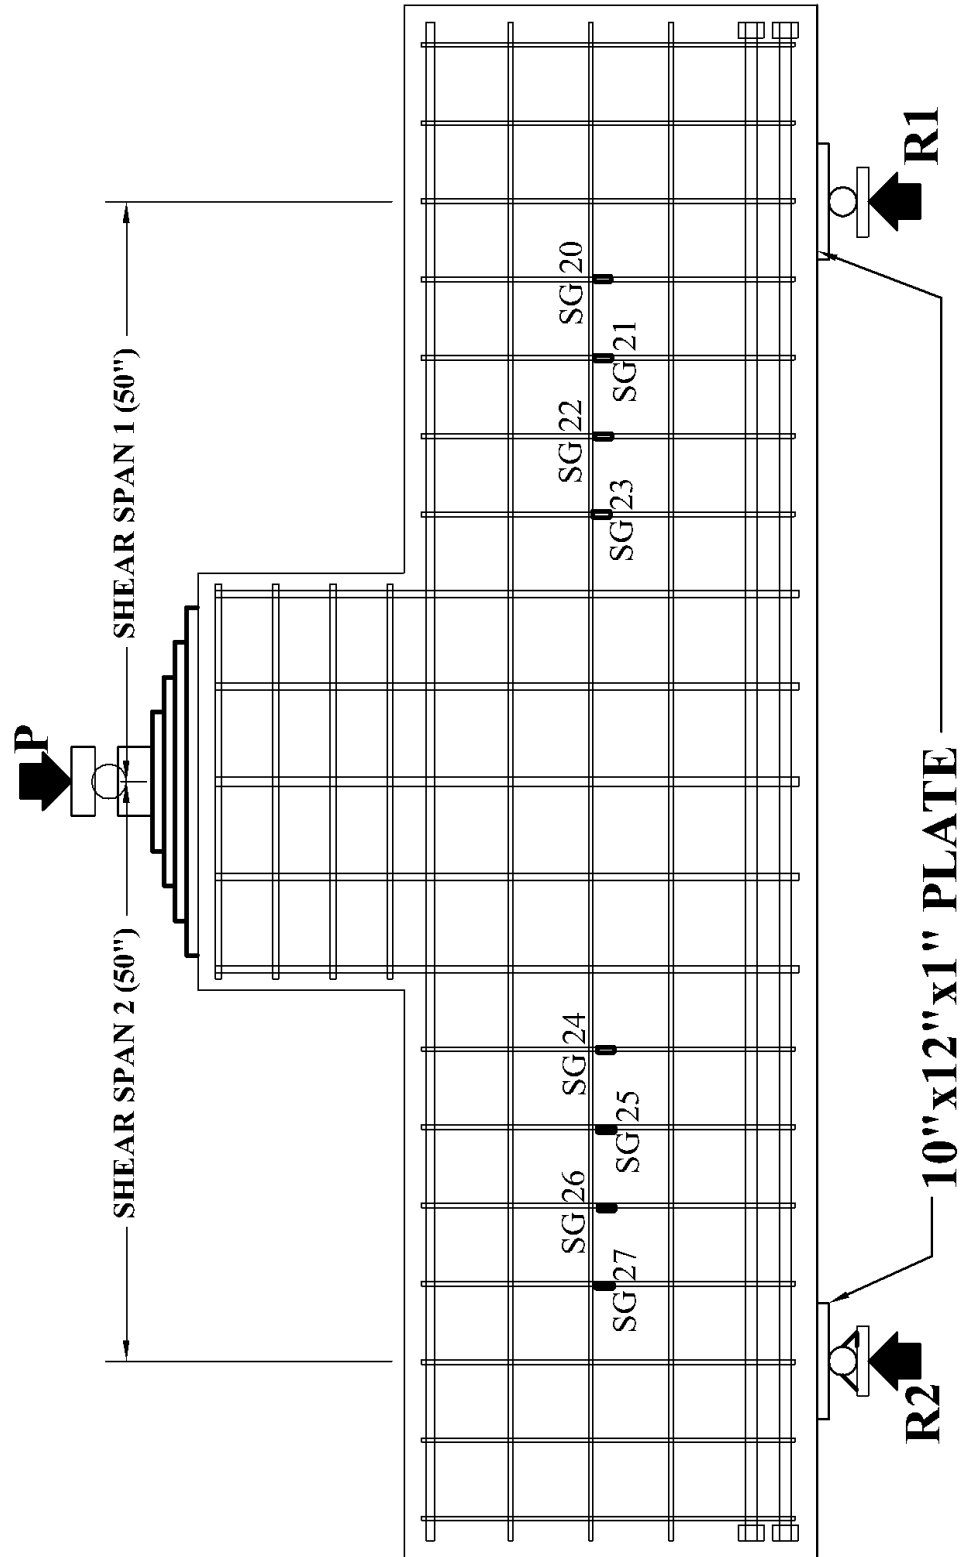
Location of strain gauges on shear reinforcement in specimens with internal shear reinforcement
